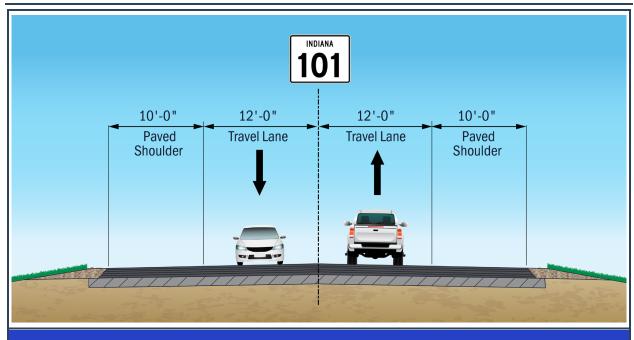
Proposed Typical Section (Rural; 55 mph)
